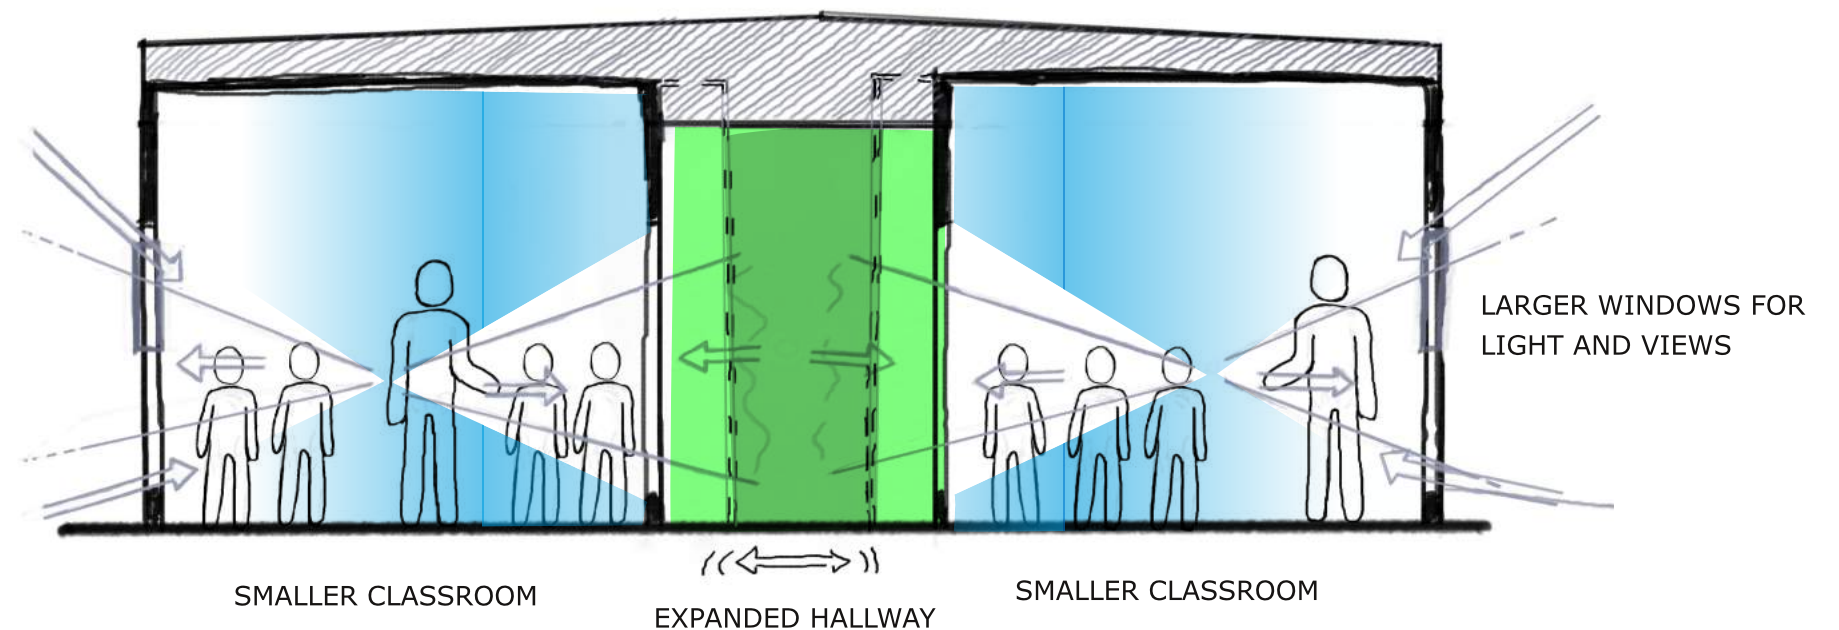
DESIGN OPEN IDEA CLASSROOM SECTION
